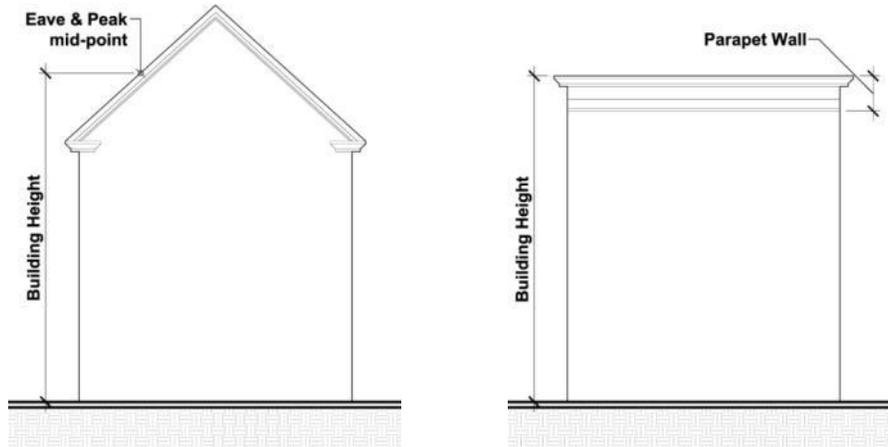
K: Example of building height measurement for a sloped roof (left) and a flat roof (right).
